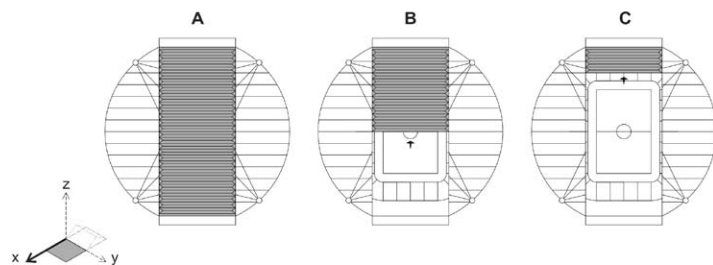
Toyota Stadium; demonstration of roof structure with folding system (A - closed, B - half-open, C - open).
